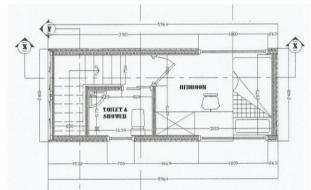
First Floor Plan of proposed 2 bedroom house.
